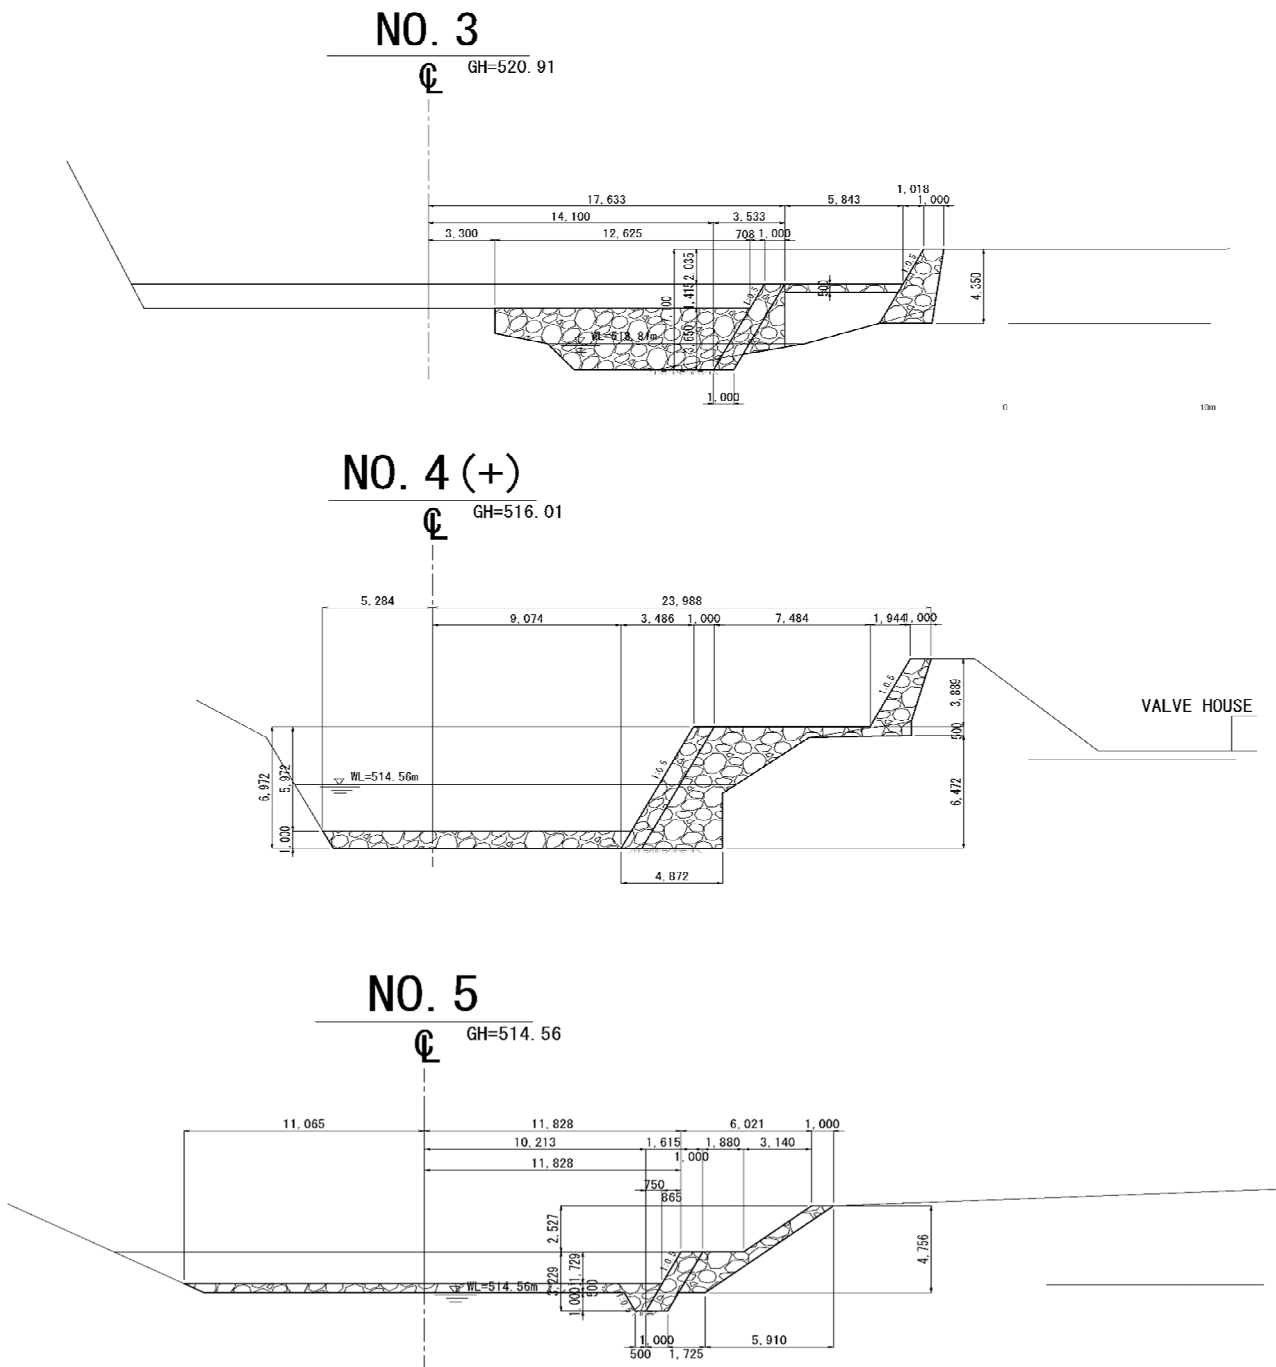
Basic Design Drawings of Emergency Repairing Measures (Representative Cross Sections)
